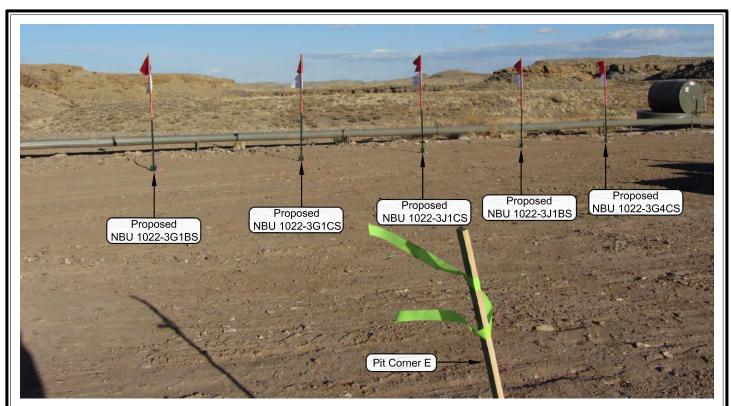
PHOTO VIEW: FROM PIT CORNER E TO LOCATION STAKE
